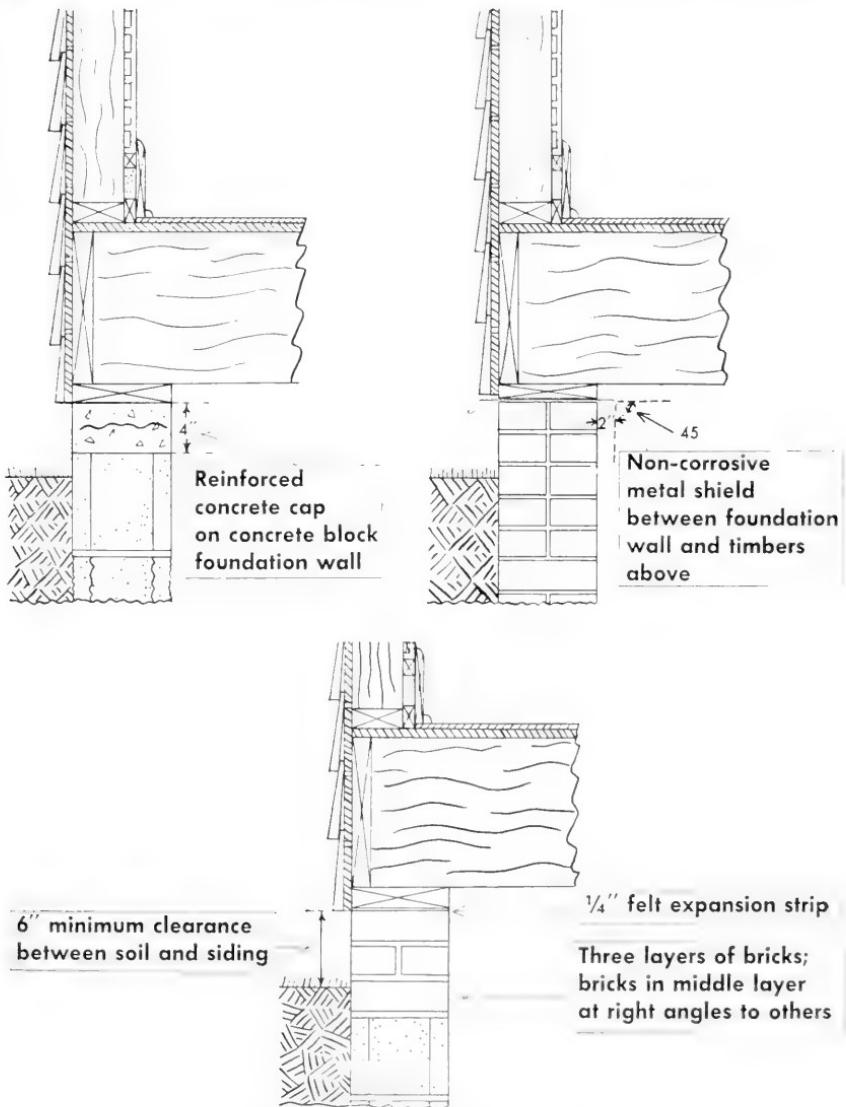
Types of shields used in preventing infestation of buildings by termites. Shields may not repel termites, but they prevent attacks that cannot be detected by careful inspections. If termites are found building shelter tubes over these shields, the tubes should be destroyed and chemicals applied for control of the termite colony.
